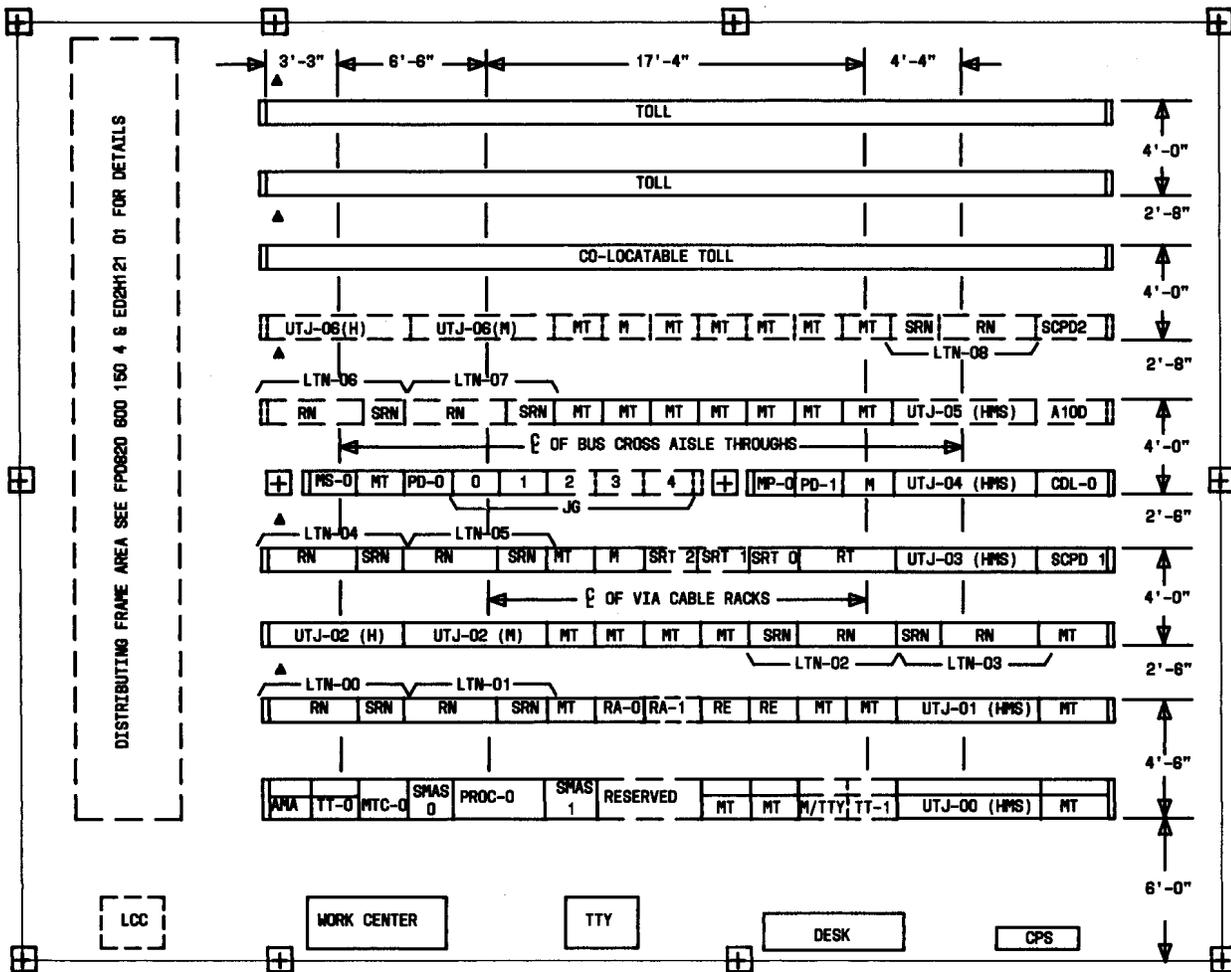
Typical No. 2B ESS Office Floor Plan With a Remreed Network
